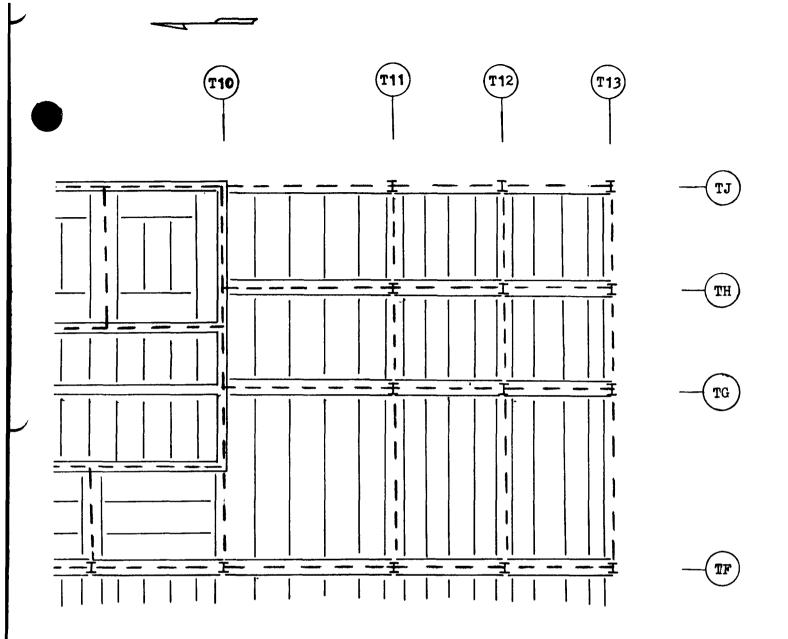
TURBINE BUILDING, EXISTING FLOOR STEEL ARRANGEMENT
